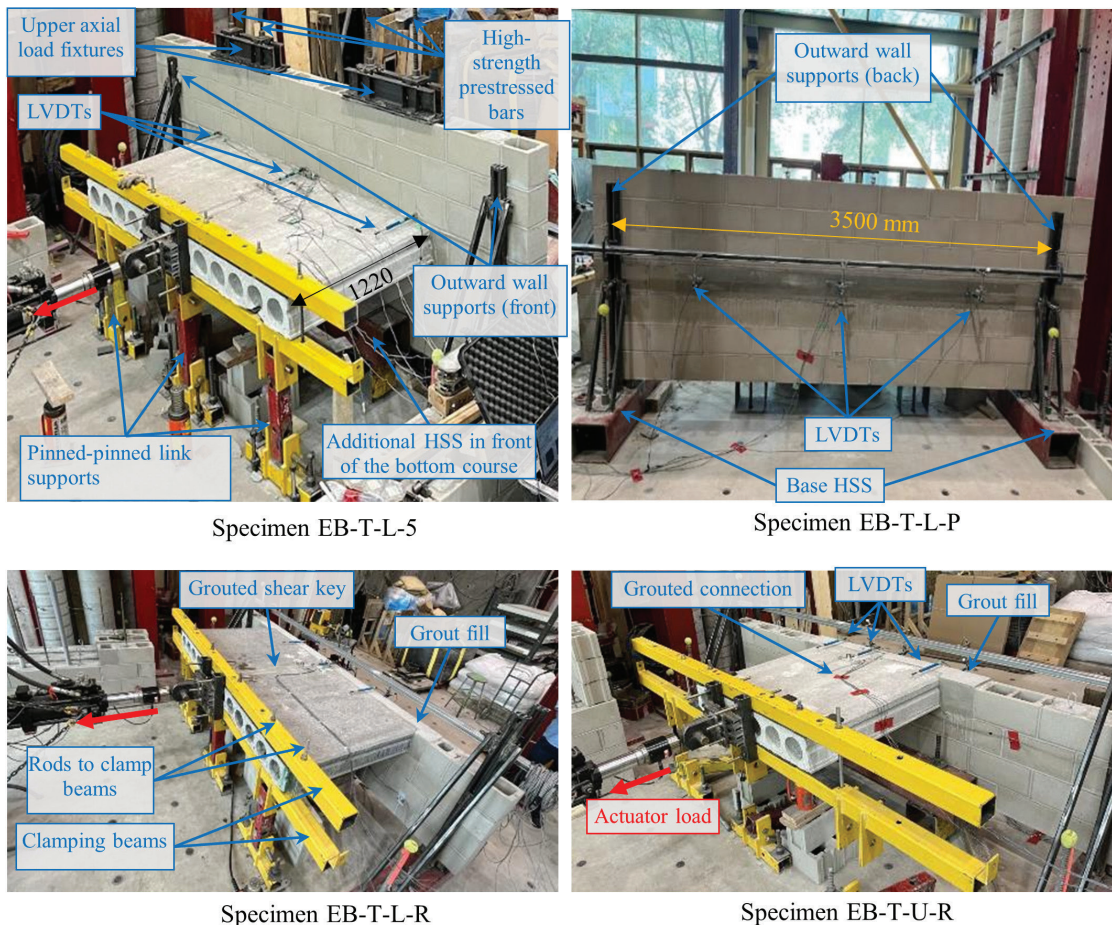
Details of the in-plane tensile test setup. Note: EB-T-L-P = end bearing configuration with tensile loading and an L-shaped bar connection with a parapet configuration; EB-T-L-R = end bearing configuration with tensile loading and an L-shaped bar connection at the roof level; EB-T-L-5 = end bearing configuration with tensile loading and an L-shaped bar connection at the fifth story; EB-T-U-R = end bearing configuration with tensile loading and a U-shaped bar connection at the roof level; HSS = hollow structural section; LVDT = linear variable displacement transducer. 1 mm = 0.0394 in.
